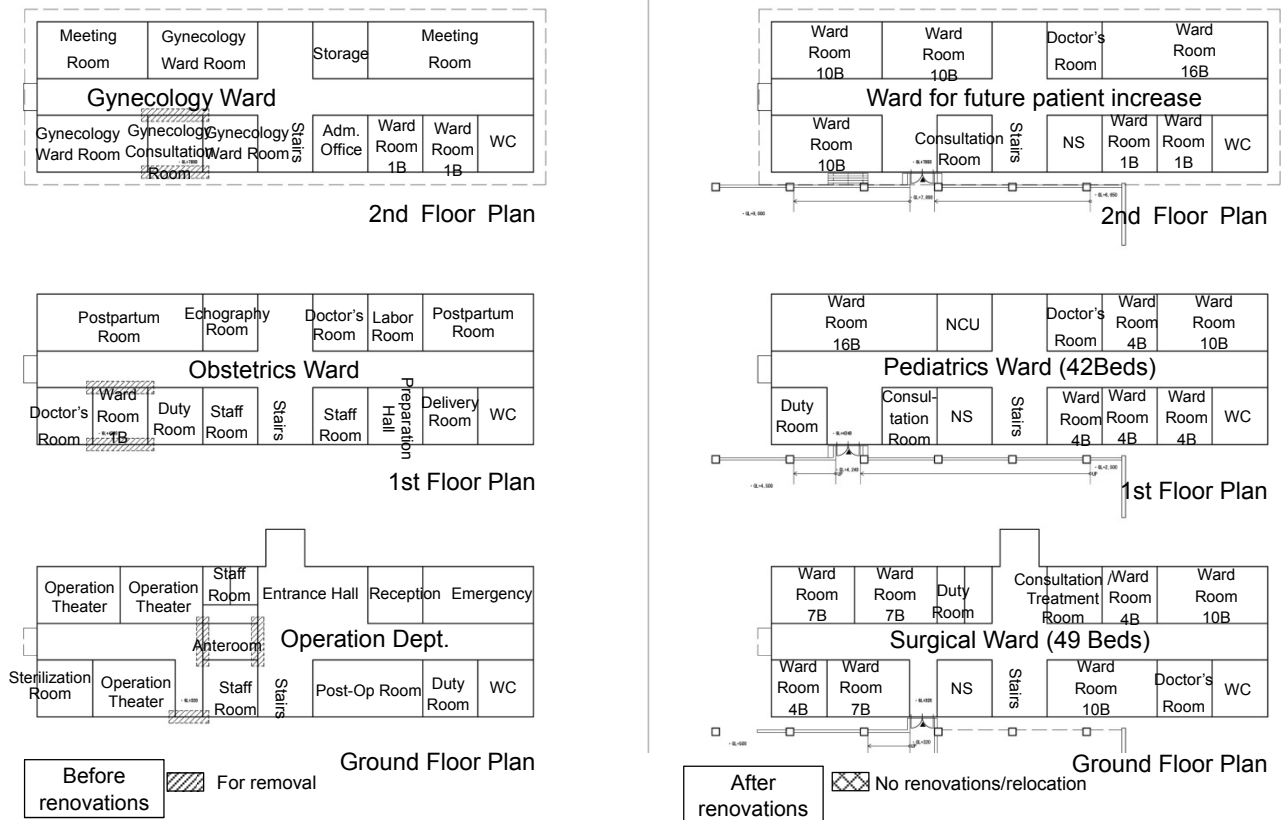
Post-Project Renovation and Relocation Plan for Existing Building C
